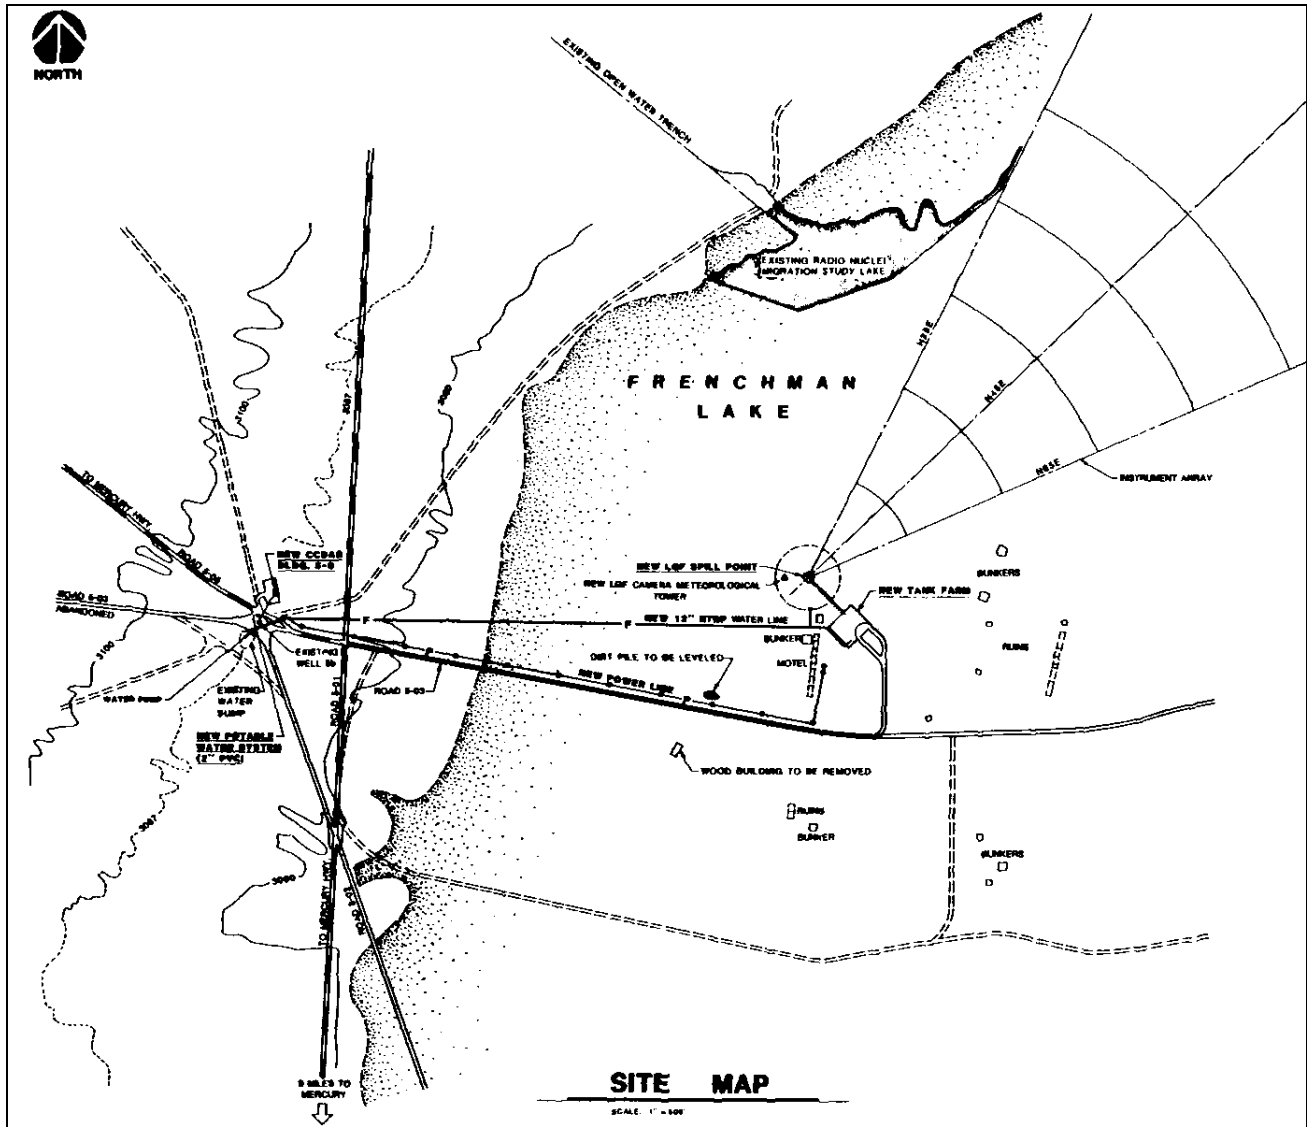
U.S. DOE Spill Test Facility Layout (Brown, et al., 1990)
